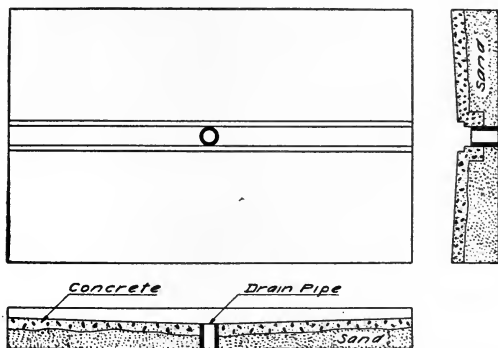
DETAILS OF FLOOR CONSTRUCTION, SHOWING DRAIN
